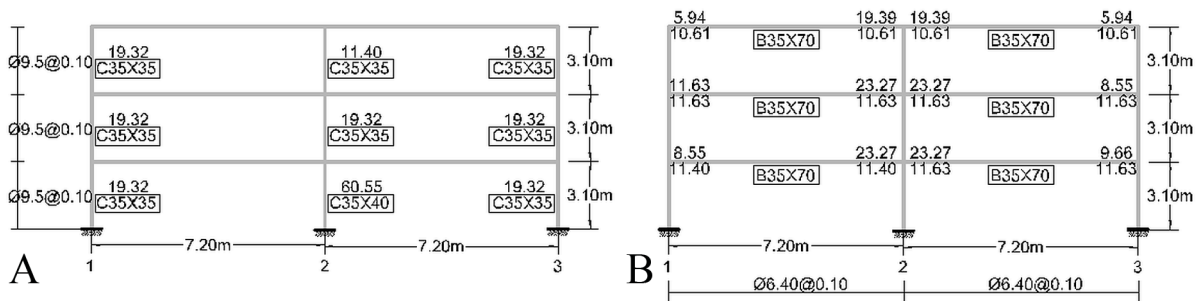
Educational facility, geometry and reinforcement in columns of the Frame 1
